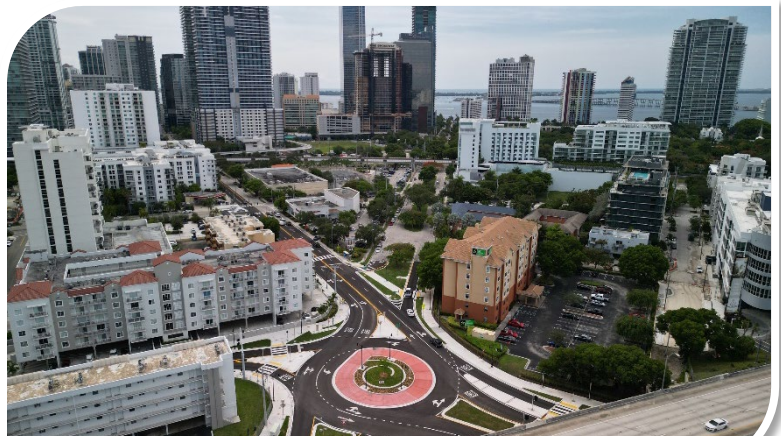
Roundabout construction at the intersection of SW 3 Avenue, SW 13 Street, and SW 15 Road as of January 2023.
